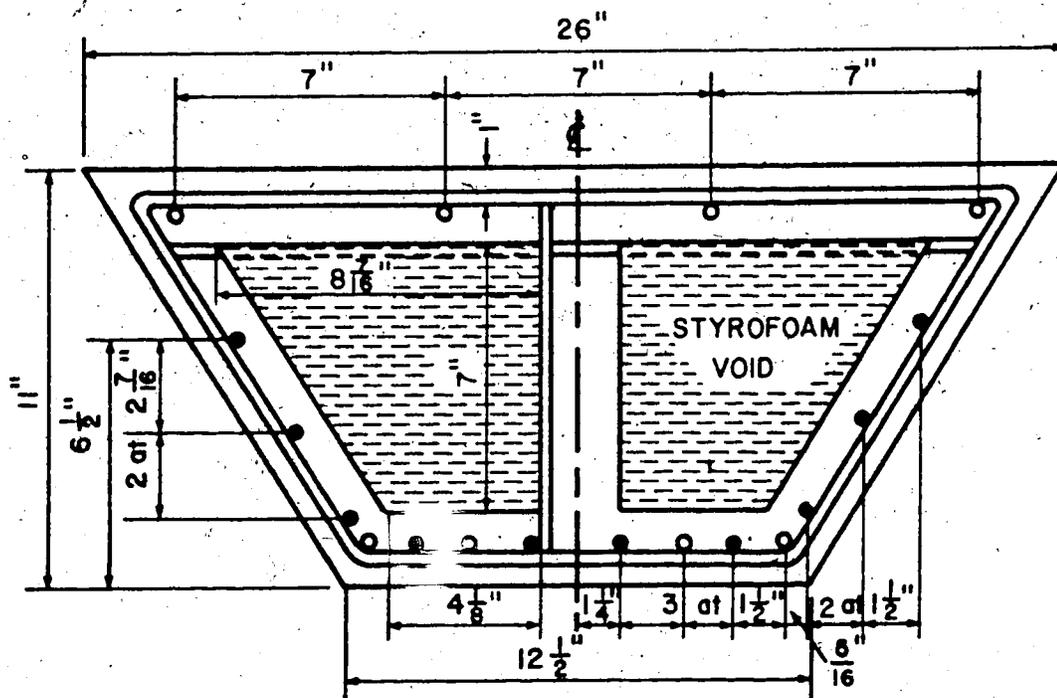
(B) TRAPEZOIDAL BEAM CROSS-SECTION
